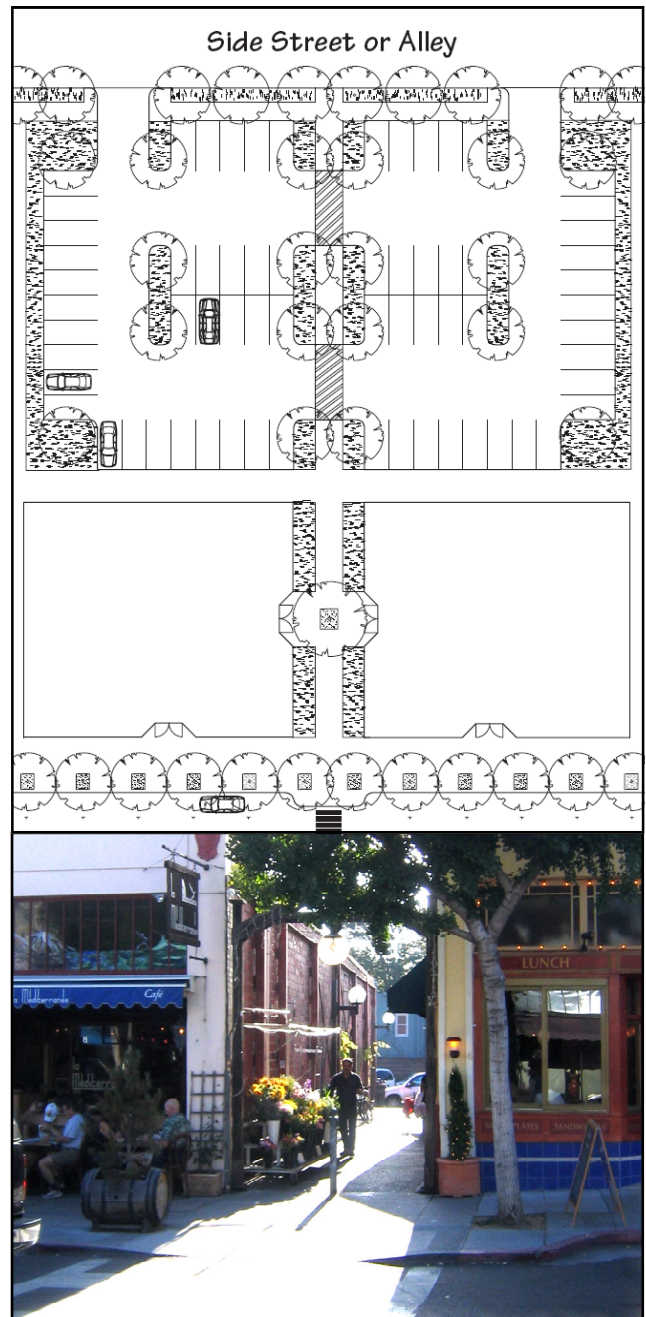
15: Parking at Rear with Paseo: To maintain a continuous active street frontage, parking should be located to the rear of buildings and be accessed from a side street or alley. Pedestrian paseos with active uses and attractive landscaping should link parking with the street frontage.
